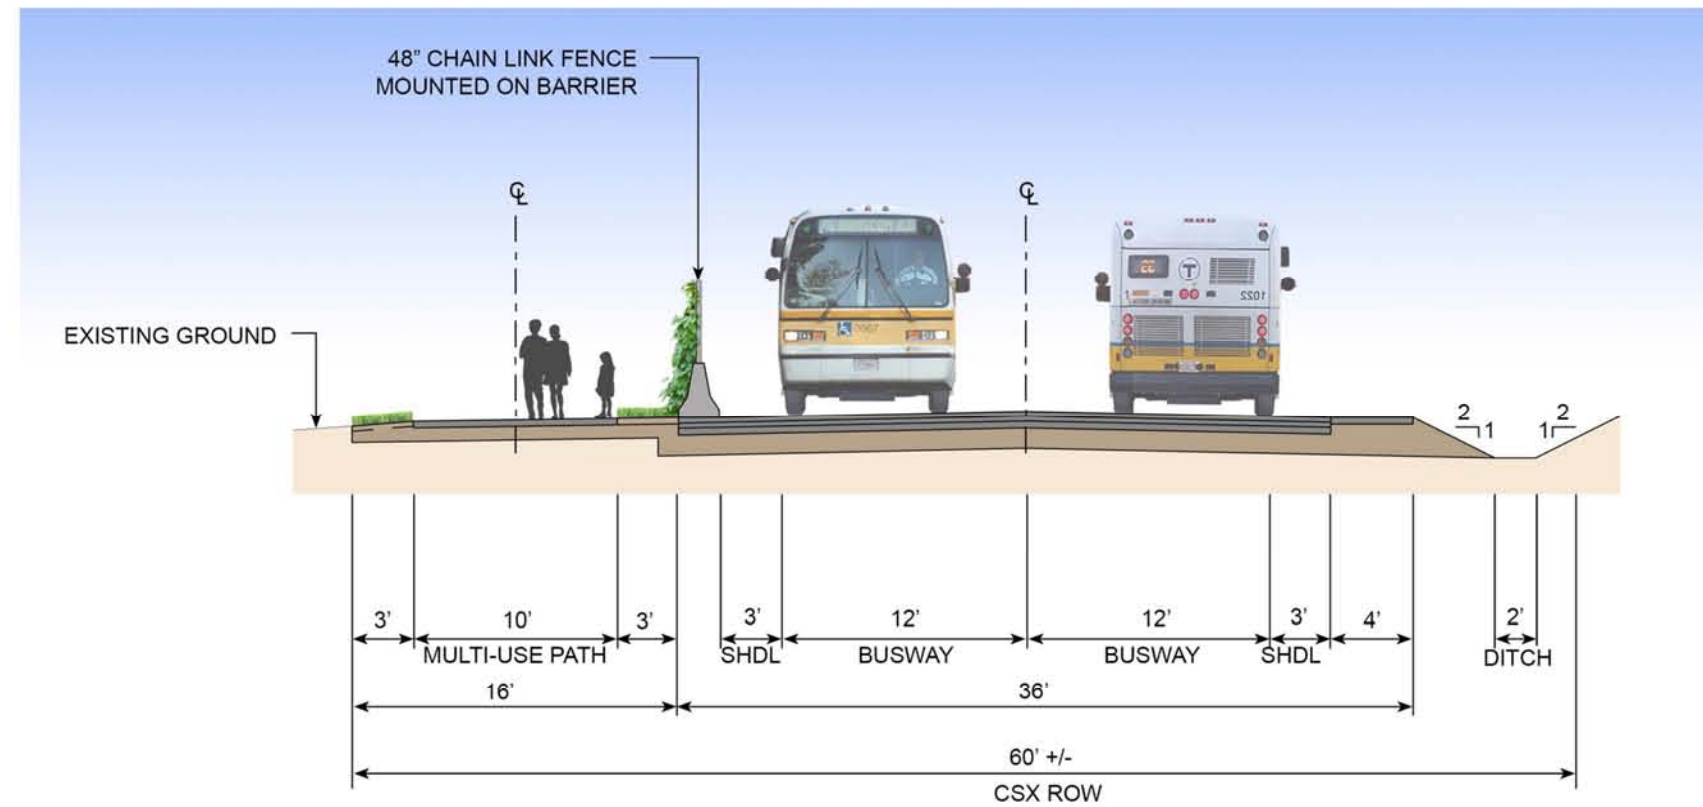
Multi-Modal Facility – Typical Section (Griffin Way to Broadway)
